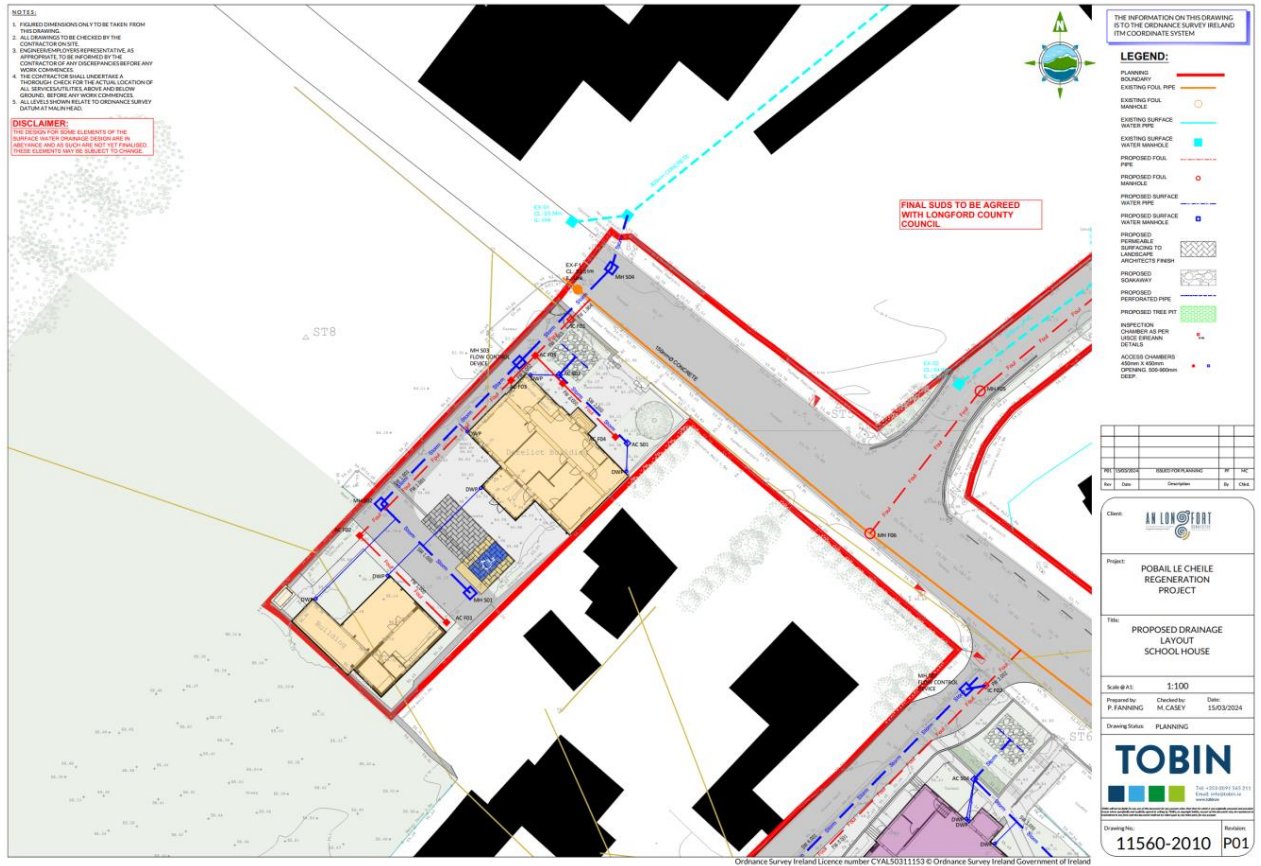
Proposed School House Drainage, drawing 11560-2010
